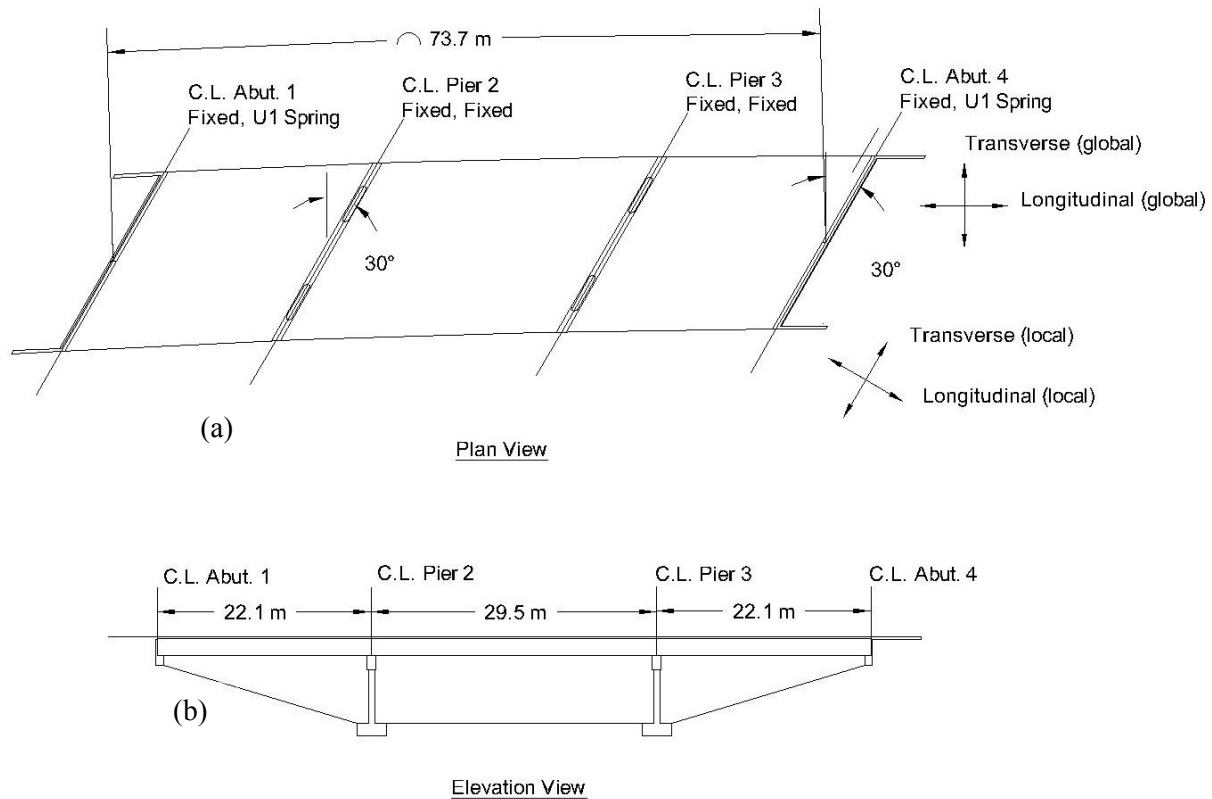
(a) Plan View (b) Elevation View of Bridge – Radius 1730 m. Skew 300
